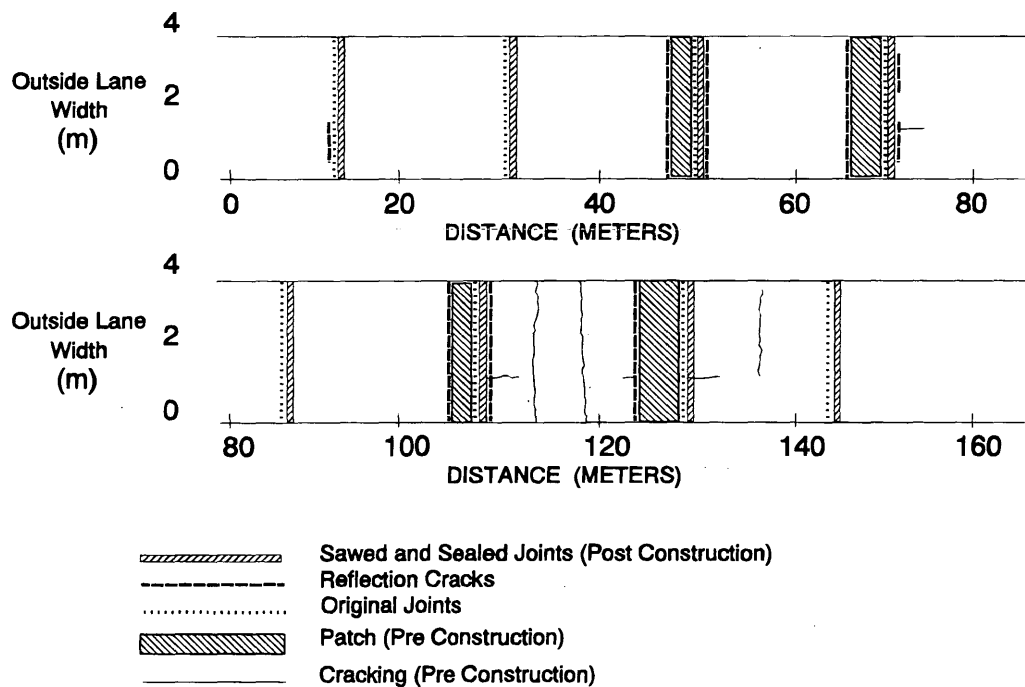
Distress summary for test section 400604 [0.1 m (4 in.) overlay, saw and seal].
